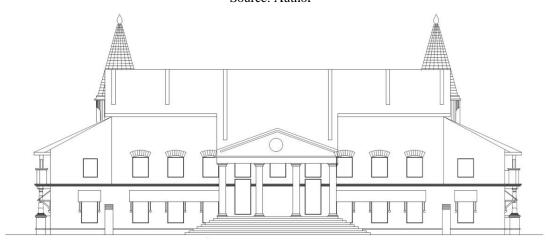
Victoria Jubilee Town Hall Rear elevation Source: Author
